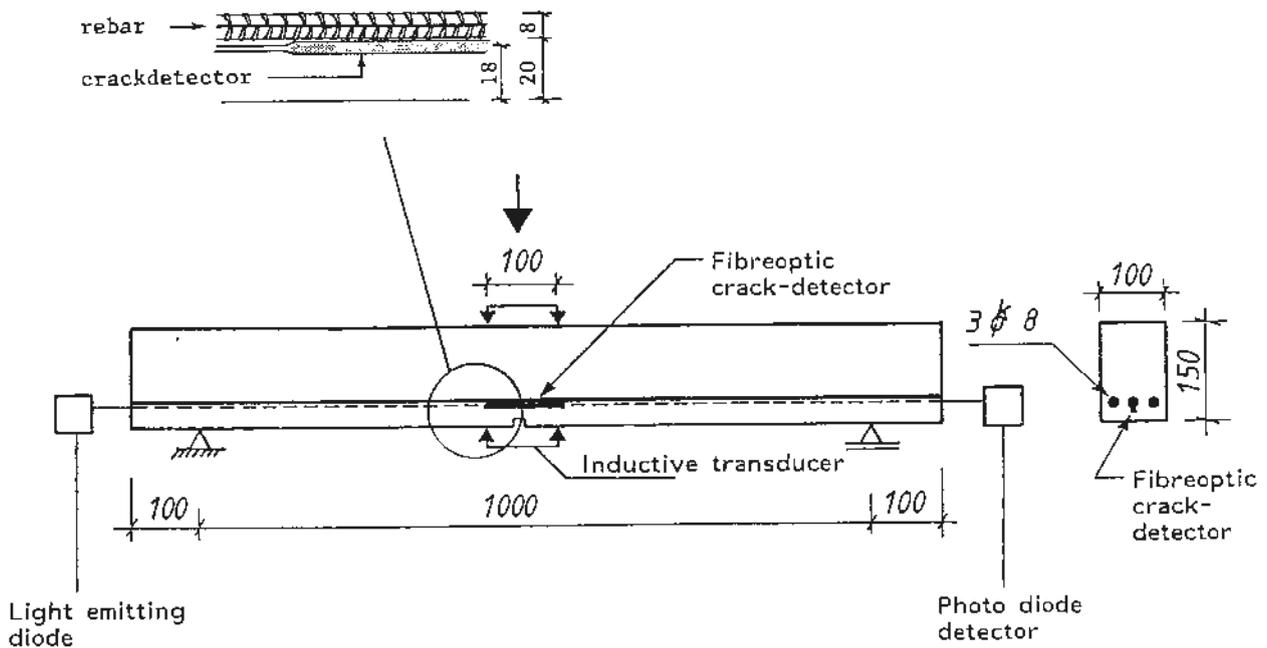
A beam undergoing three-point-bending, measurement in millimetres
